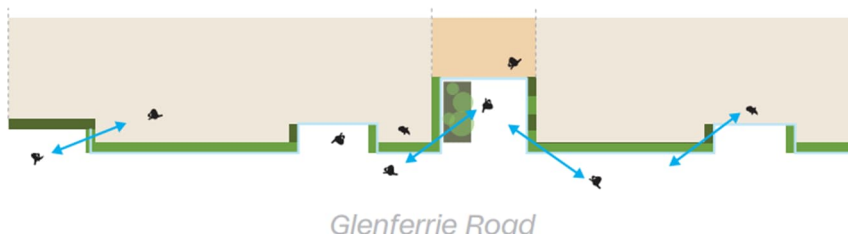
Conceptual plan illustrating the ground floor façade and entry relationship to Glenferrie Road footpath
